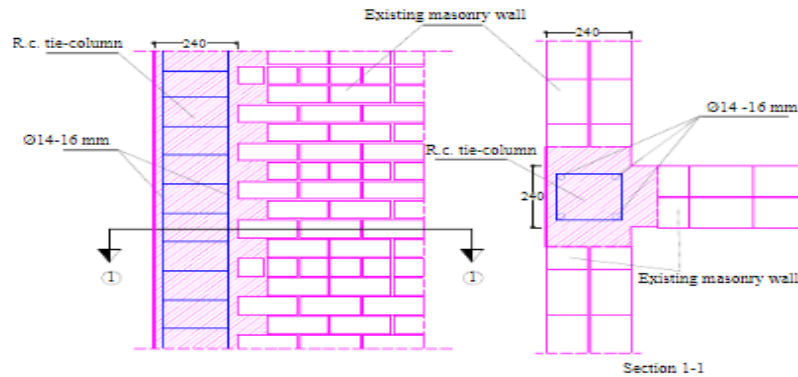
Confining URM using reinforced concrete column (Elgawady & Lestuzzi, 2004)
